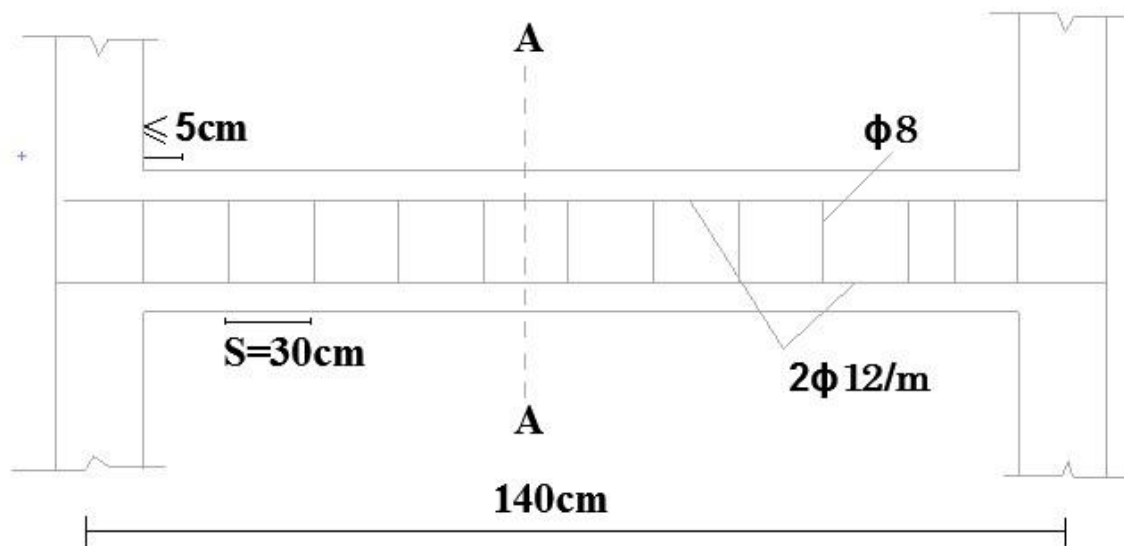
Steel Reinforcement that connect two parallel beam longitudinal section
